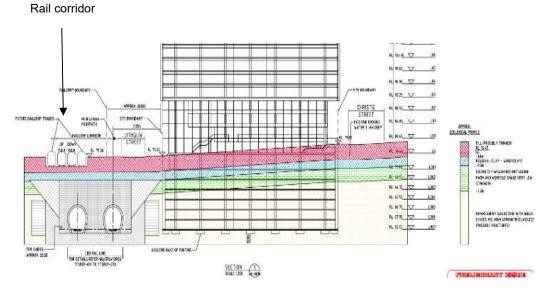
Initial scheme showing ground conditions and proposed rail tunnels on western boundary
